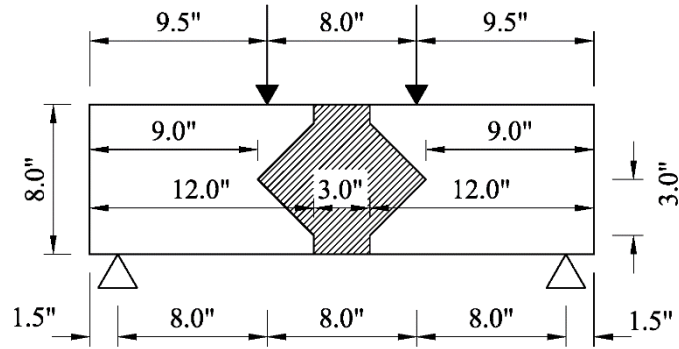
Details of test specimens for ASTM C78 with notched joint
